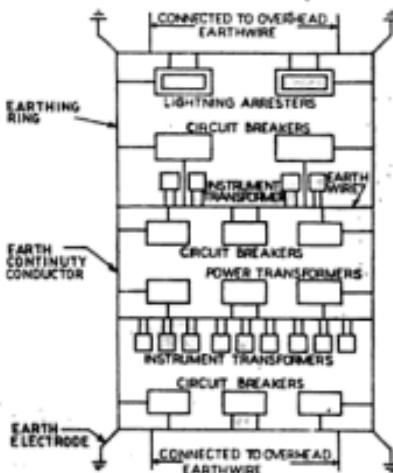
(a) A typical earthing arrangement for an outdoor substation
